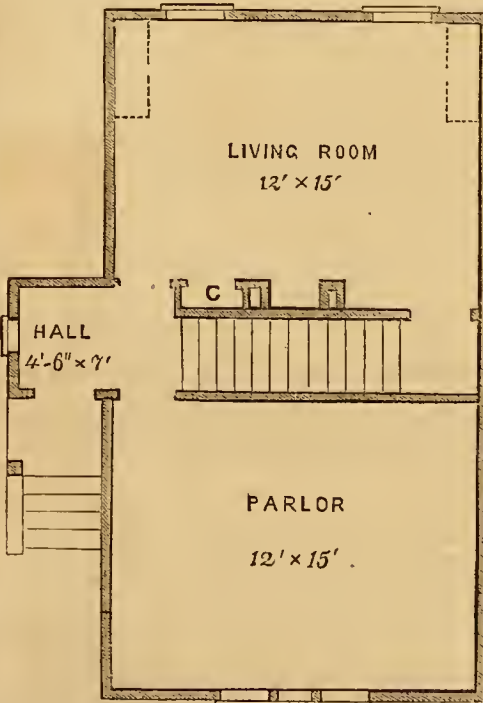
FIRST STORY.—Scale, 8 feet to 1 inch.
